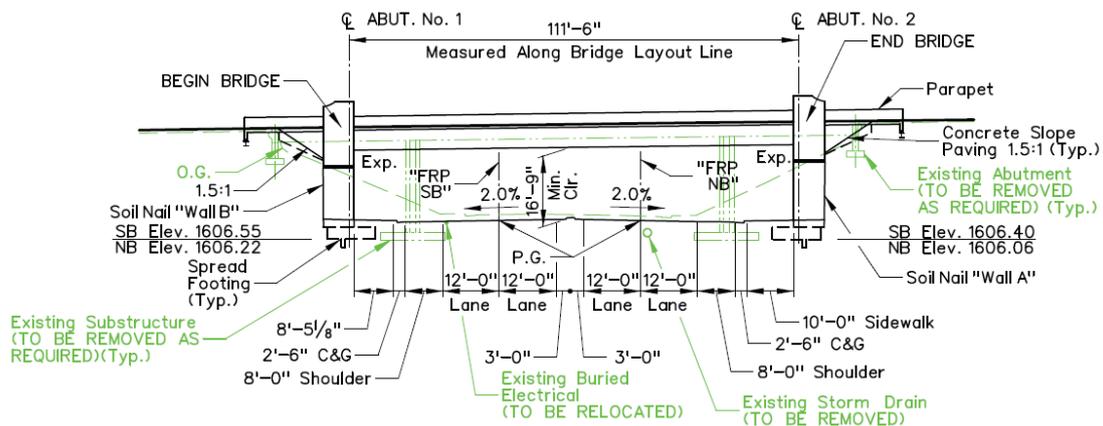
I-15 over Falcon Ridge Parkway - elevation view
